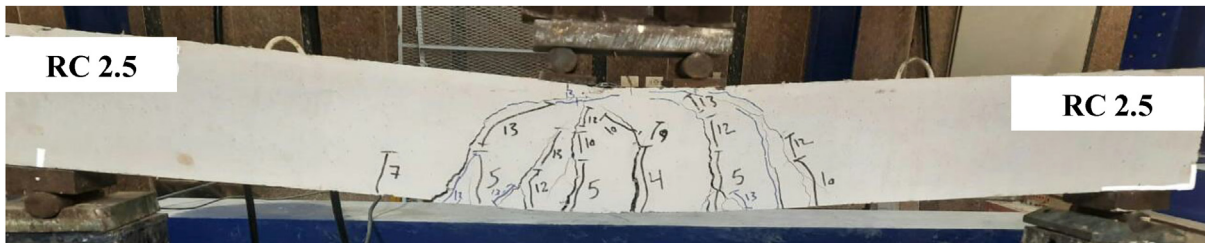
Crack patterns and failure modes for HSC beams reinforced with GFRP bars.
